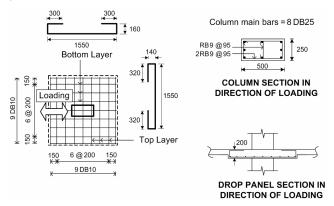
Bonded reinforcing bars in drop panel and column of the specimen with drop panel
